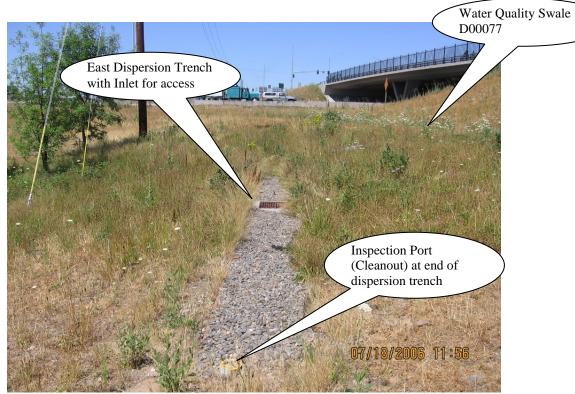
East Dispersion Trench, looking west. Interstate 5 is the background.
